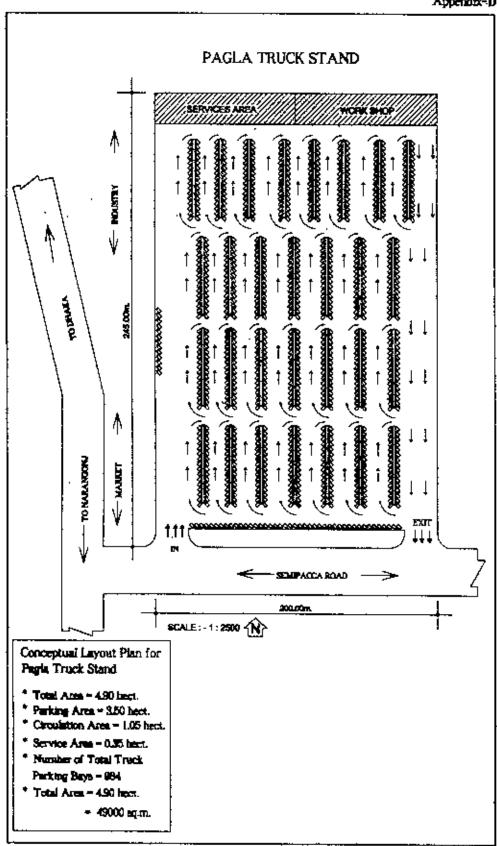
Conceptual Layout Plan for Pagla Truck Terminal
